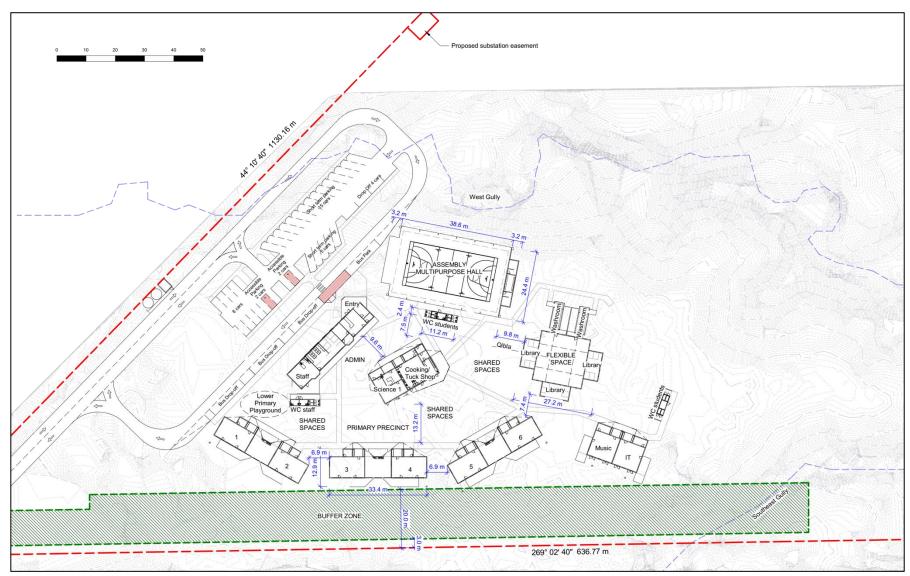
PROPOSED STAGE 5 PLAN
